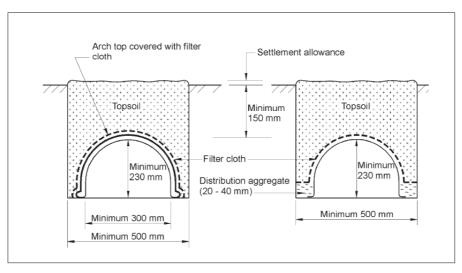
SELF-SUPPORTING ARCH TRENCH
